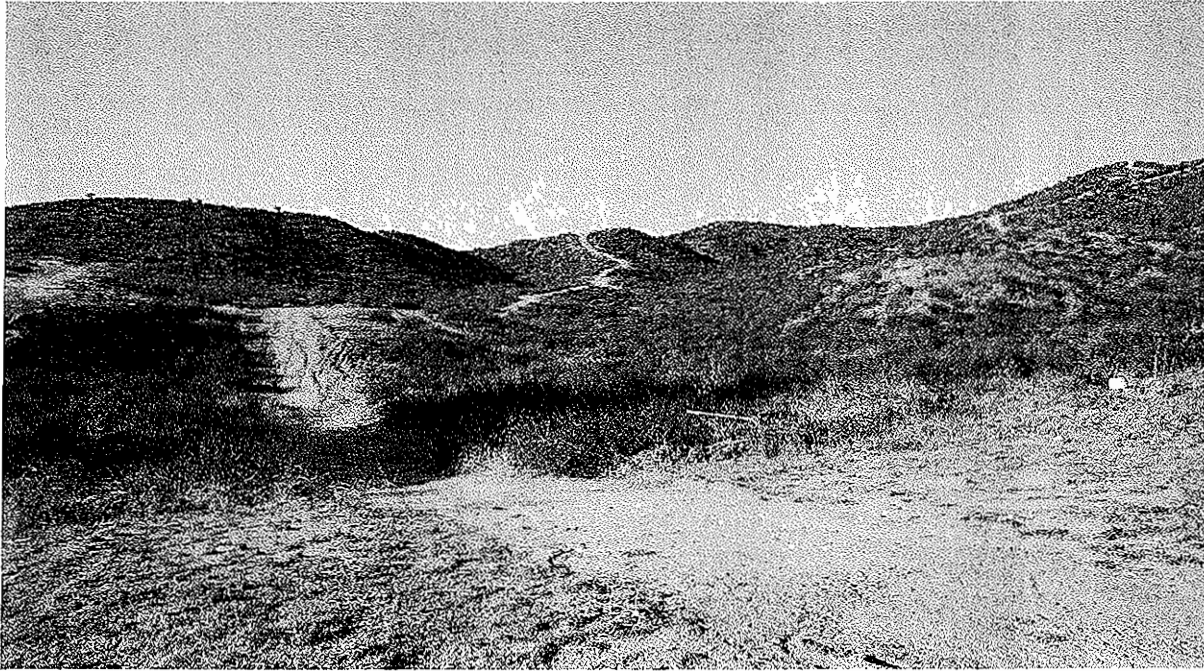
Location of proposed parking lot from the center of the site looking north.
